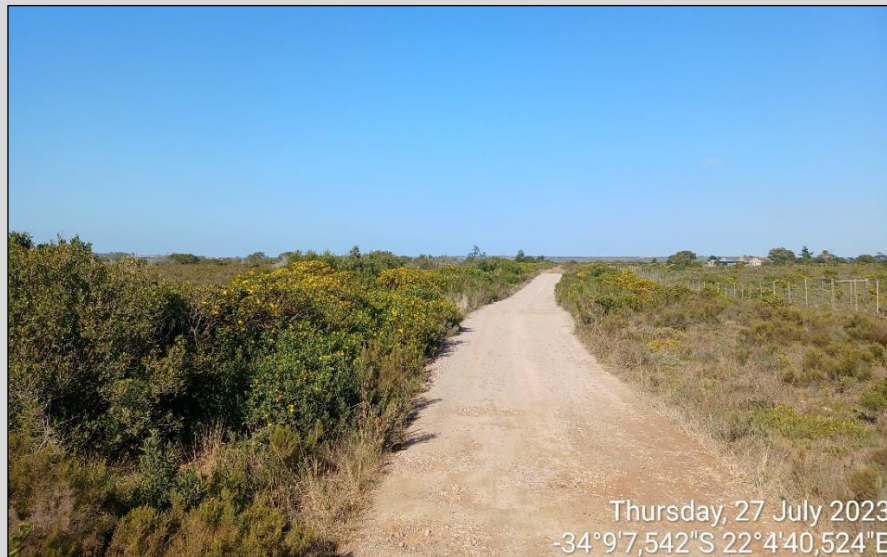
Photograph of existing Skilpad Street (west of 209/220).
